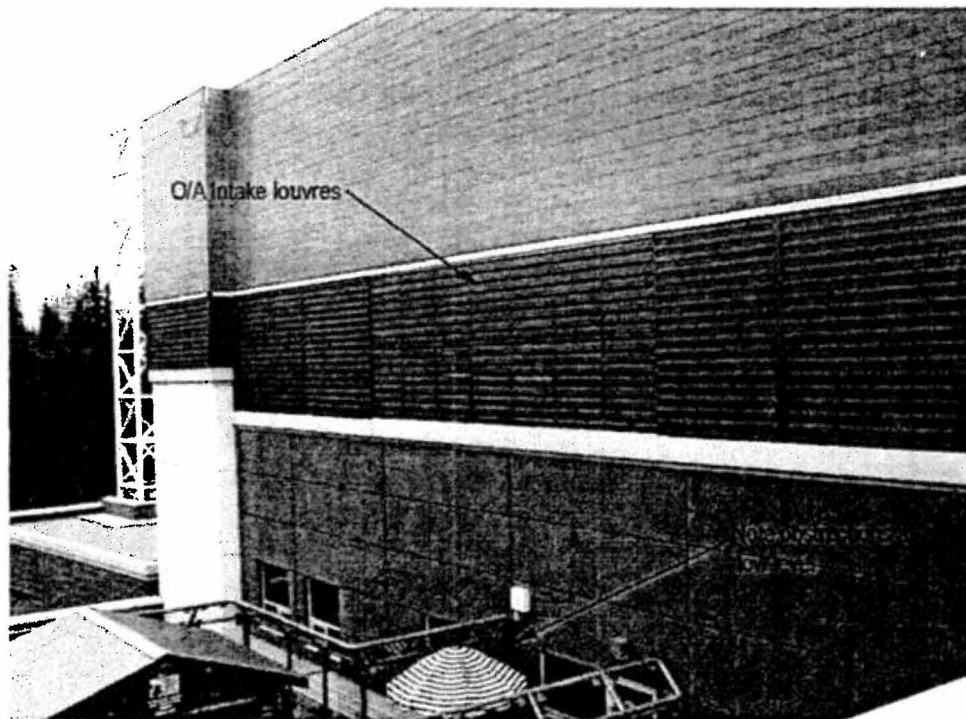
SW Facing Wall of Fan Room viewed to west.
